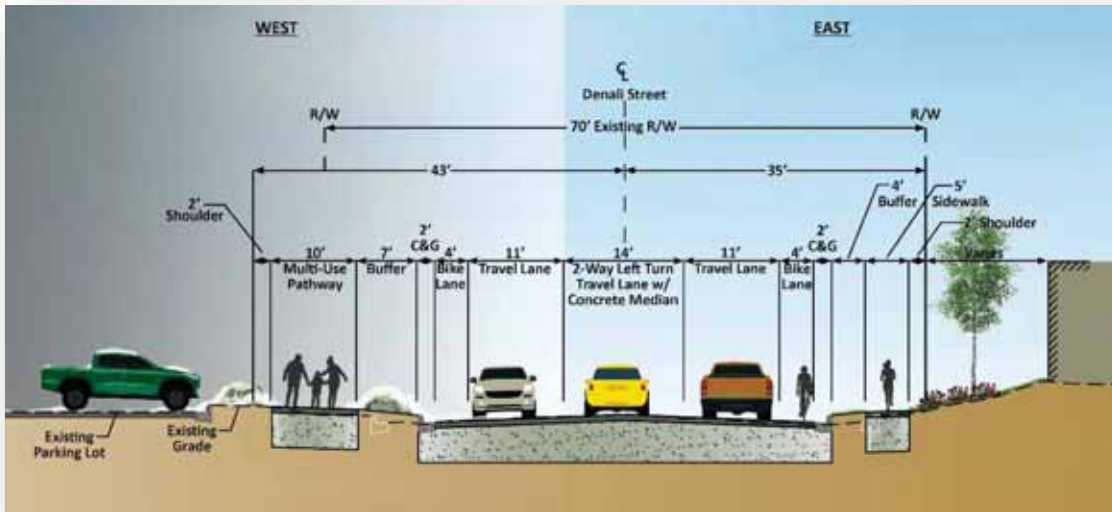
Denali Street (36th Avenue to Benson Boulevard) – Alternative 2
